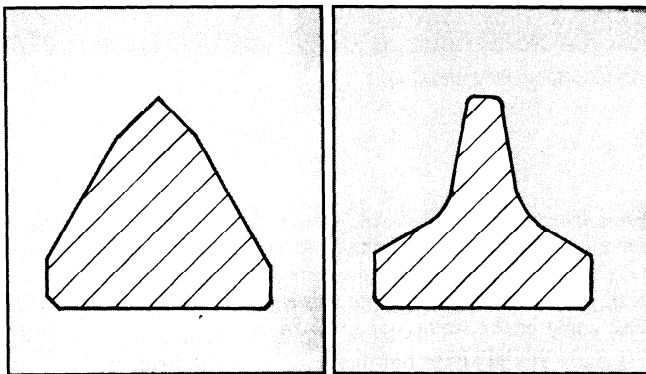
Wedge and constant section disk cutters (courtesy: Robbins Co.).
